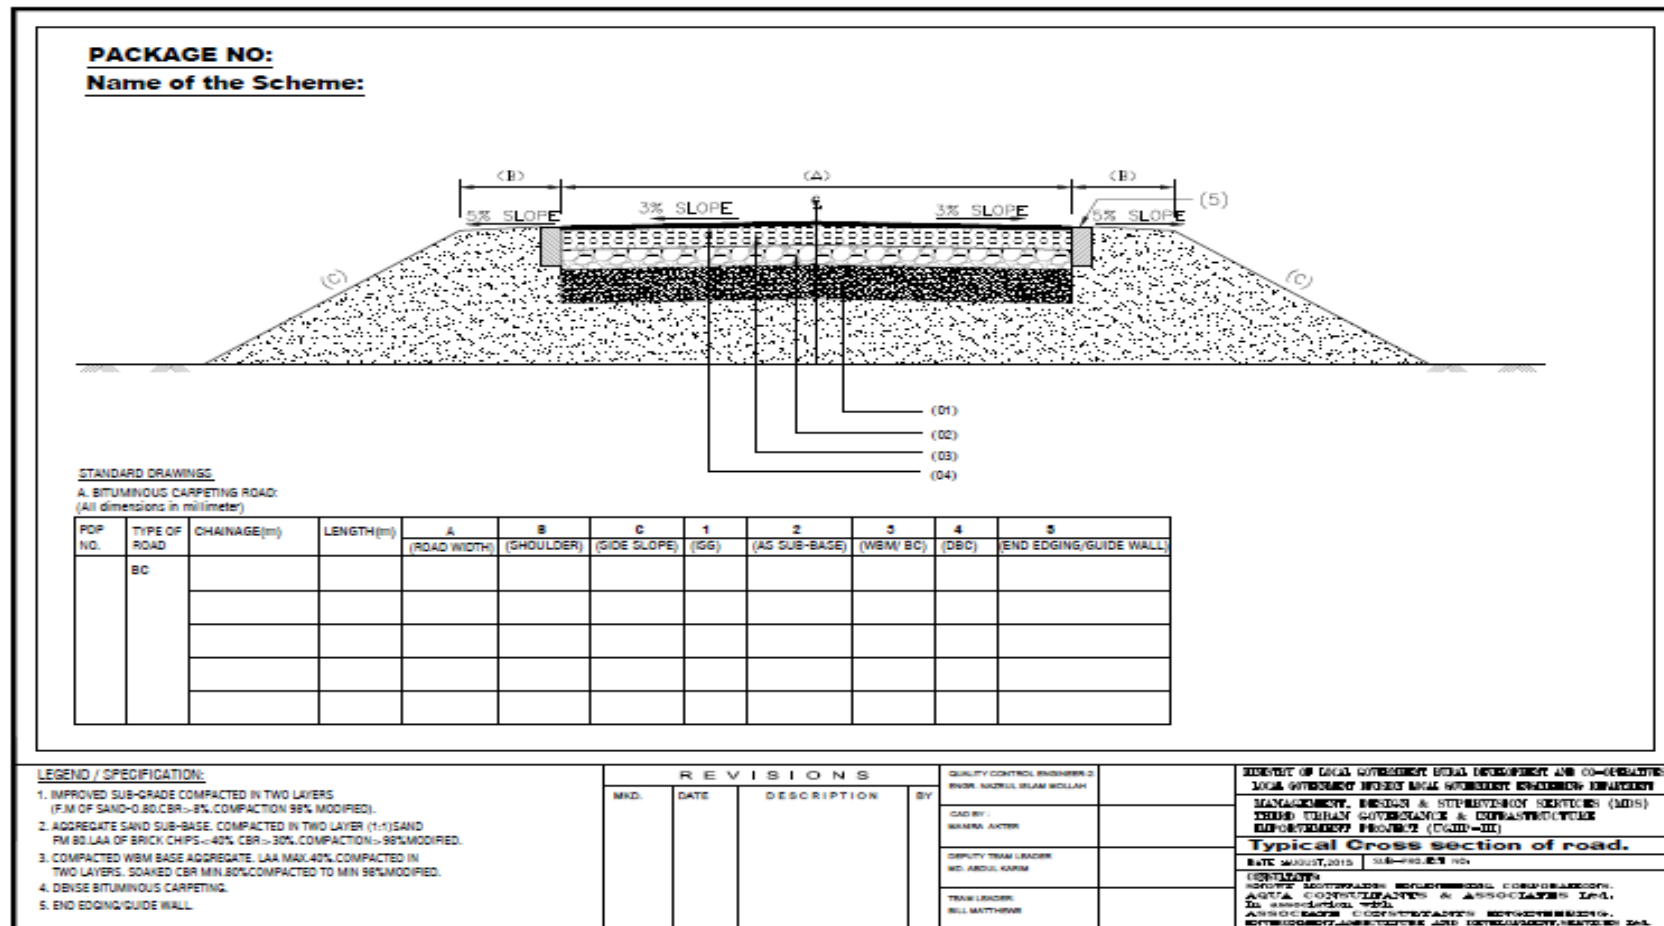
Typical Cross-Section of Bituminous Carpeting Road
